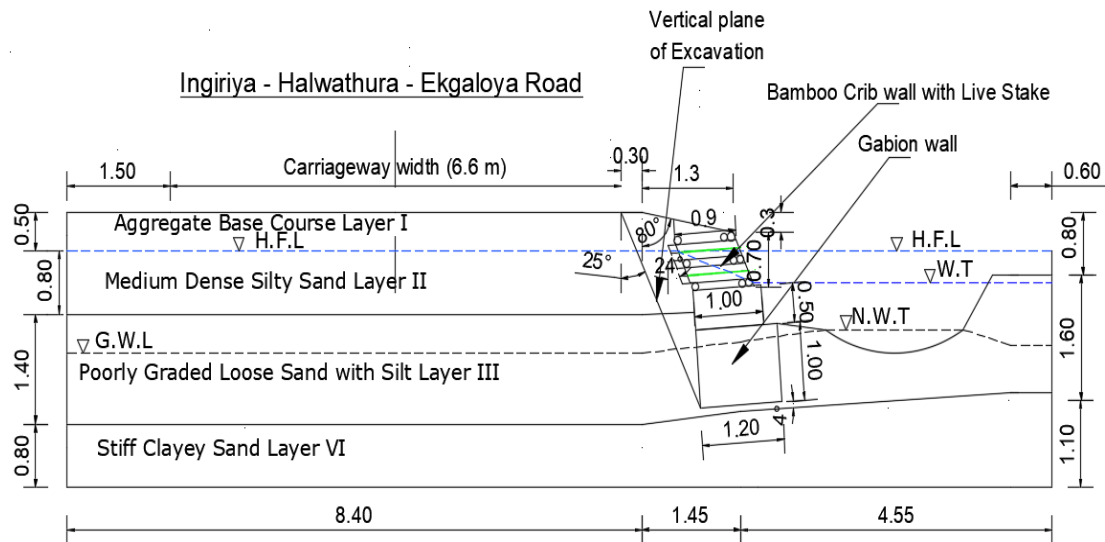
Proposed bioengineered retaining wall with Gabion at the toe
